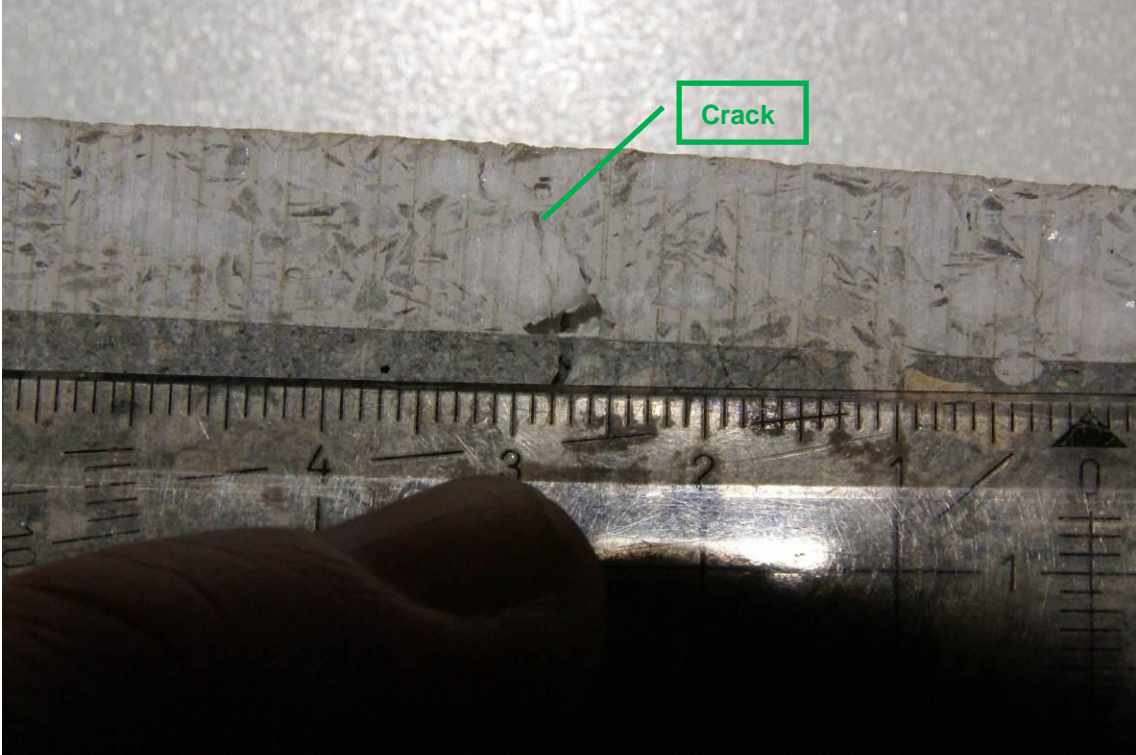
, Measuring the width of the crack in the additional test (approx. 0.6 mm).
